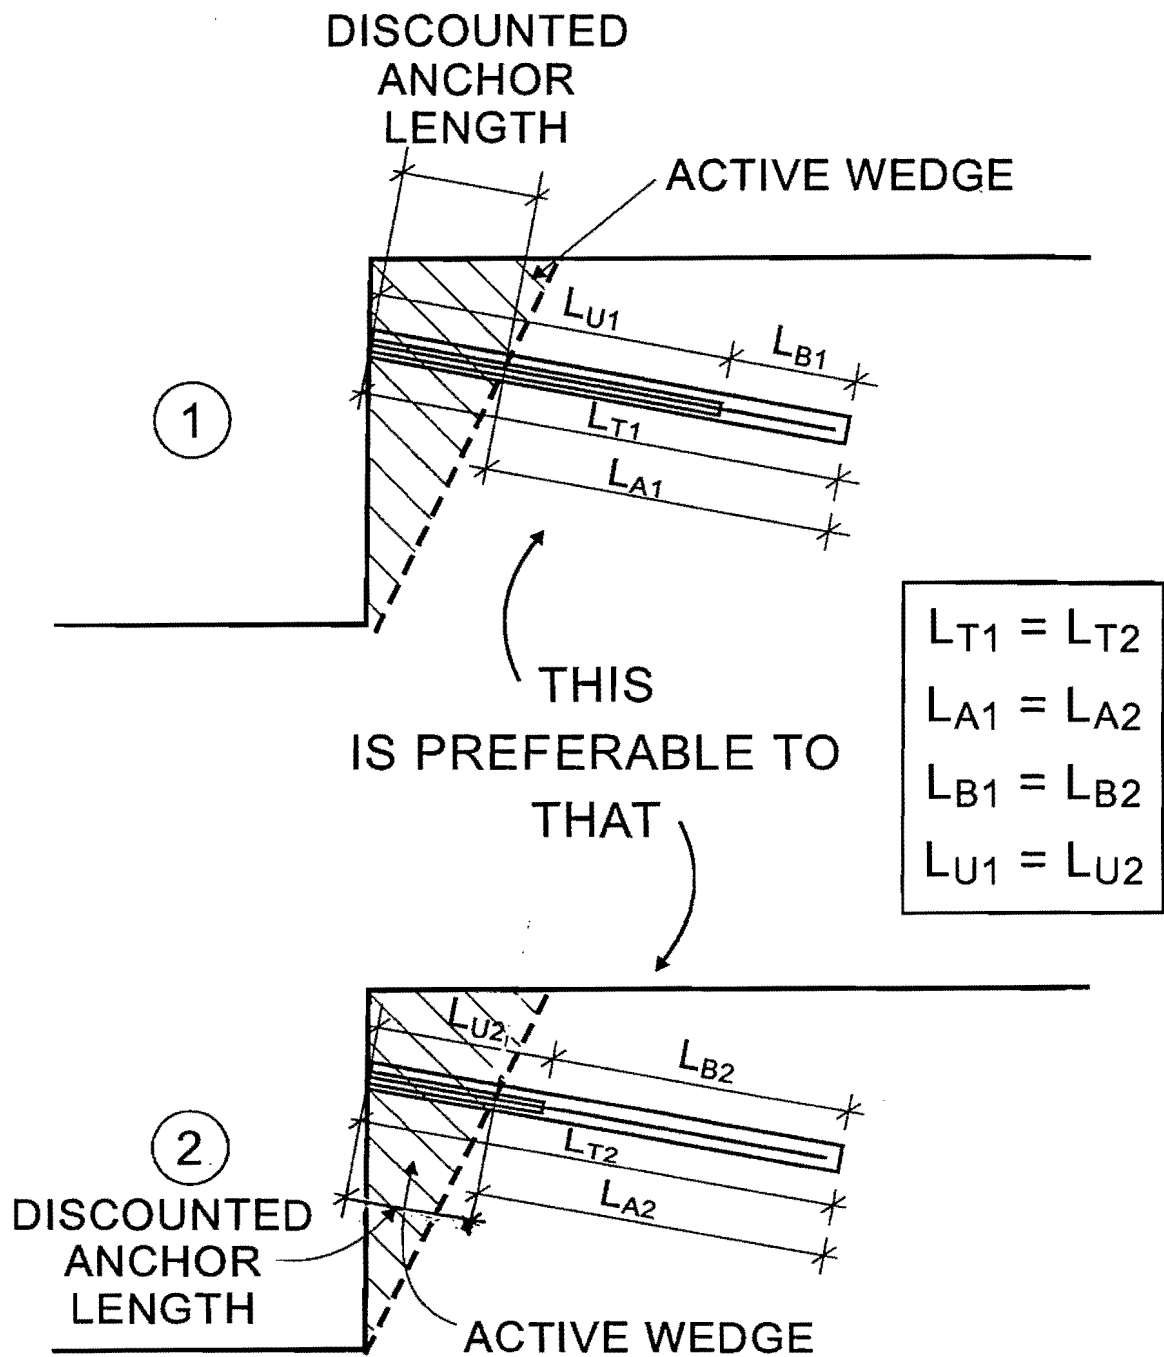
Grouted Anchors Should Have Short Tendon Bond Length
